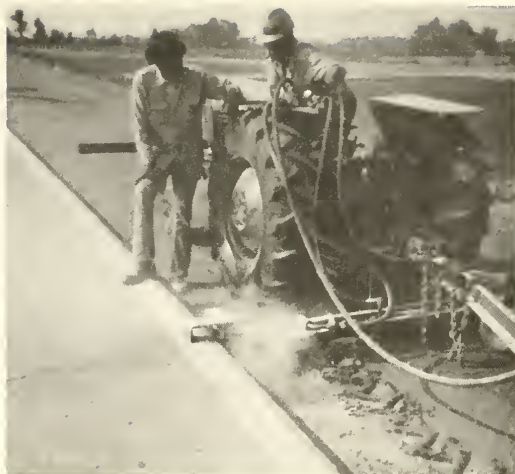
DRILLING HOLES FOR TIE BARS IN CONCRETE SHOULDERS
